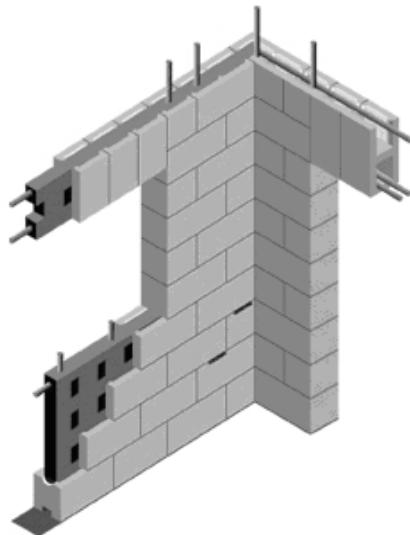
Structure of wall built with Durisol® wall forms. (Photo courtesy of Durisol Building Systems Inc.)
